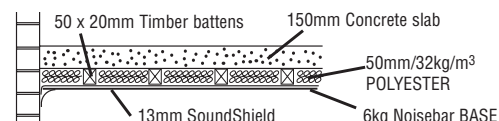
Concrete and tiled floor L'nT,w+Ci=44 - To insulate new or existing concrete slab wet area floors before tiling. Edges returned at wall to isolate floor from walls.
